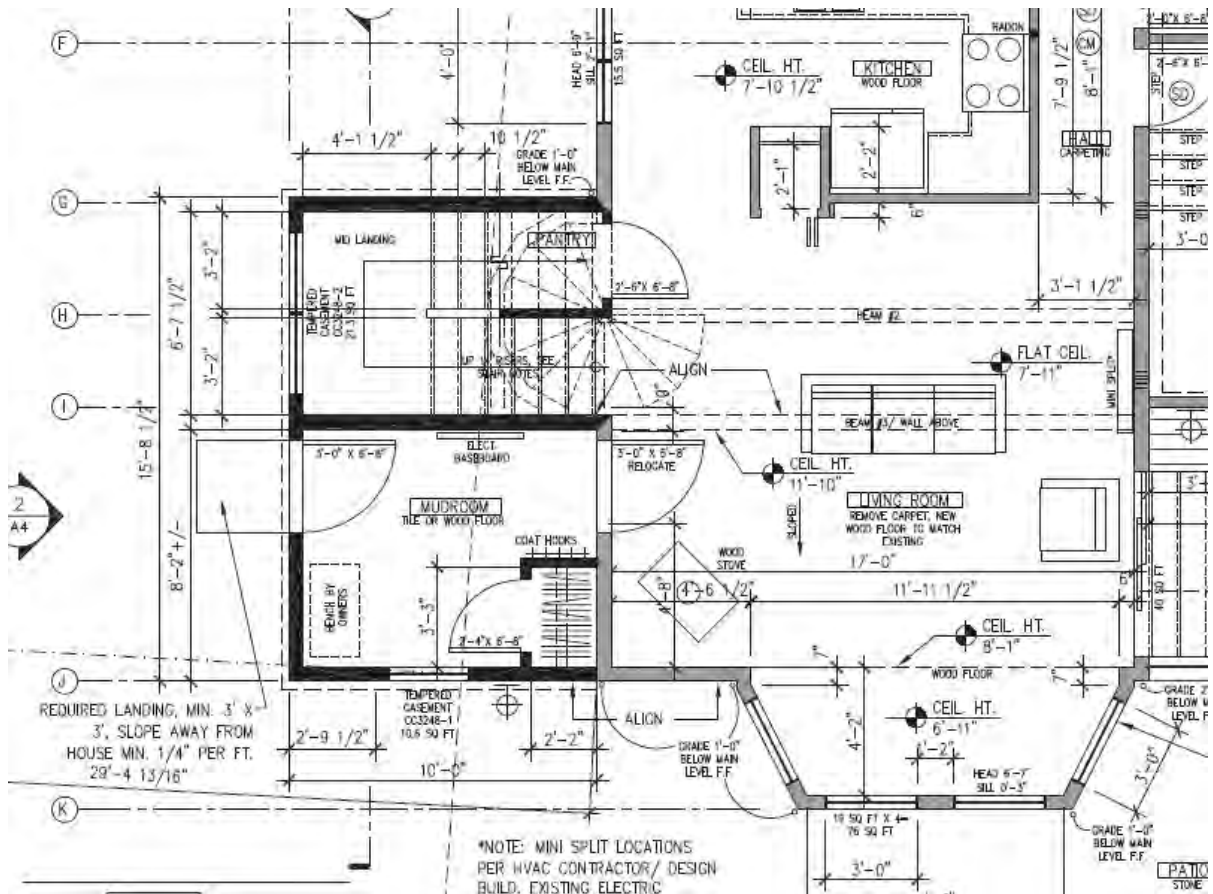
Detail view of interior layout for the proposed staircase and mudroom addition to the western façade of the residence.
